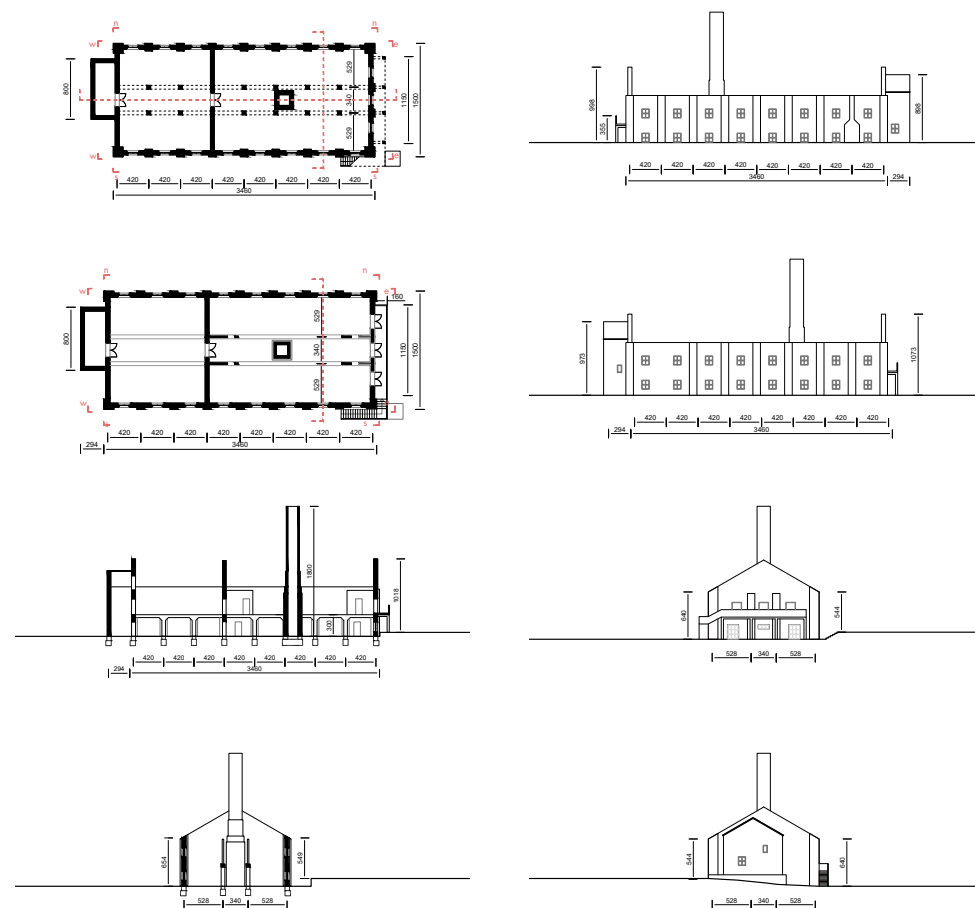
Plans and sections of Magazine 5. Reconstructed based on typical warehouse drawings and on-site measurements.
